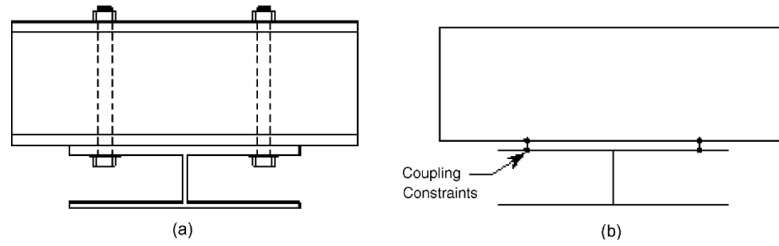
Method of modelling a bolted GFRP deck-to- steel girder connection [28]
